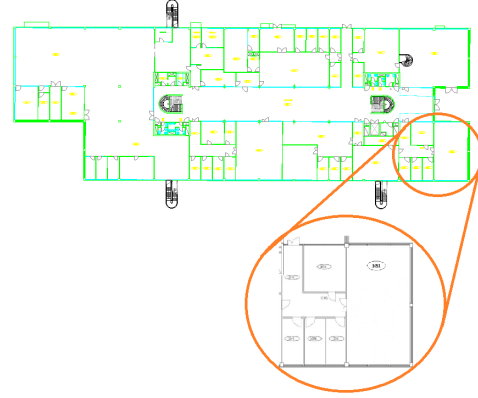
Bird-view of Building C plant, with the pilot area highlighted
